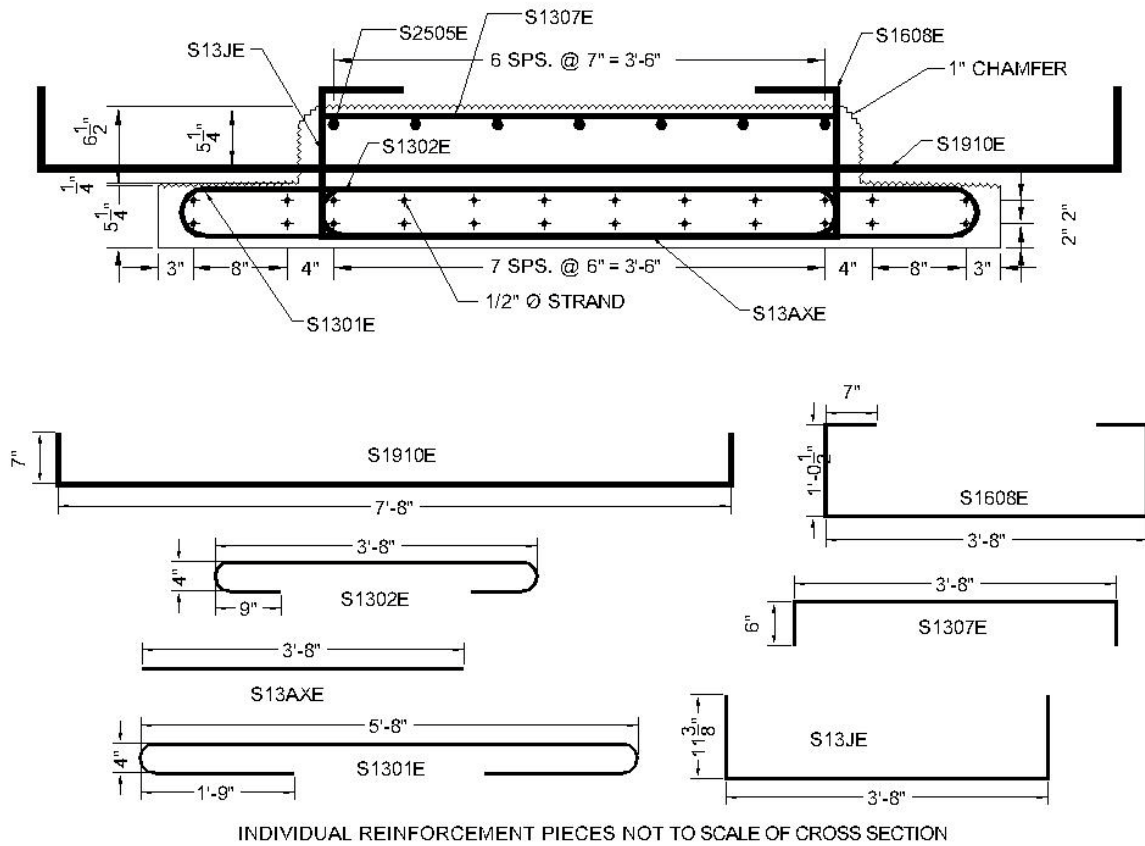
Cross section and individual reinforcement details for east end of precast beam 2N
